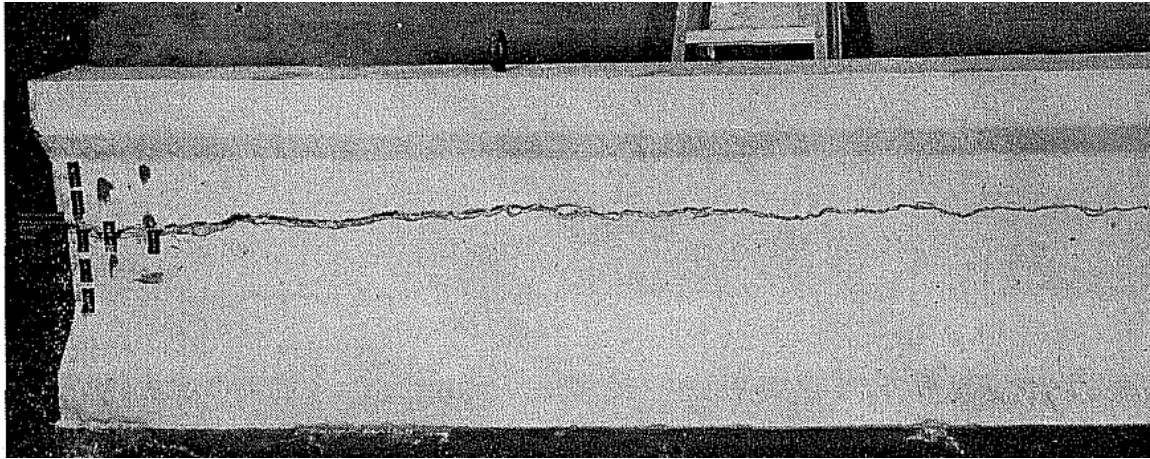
Severe cracking in a pretensioned concrete beam end region
